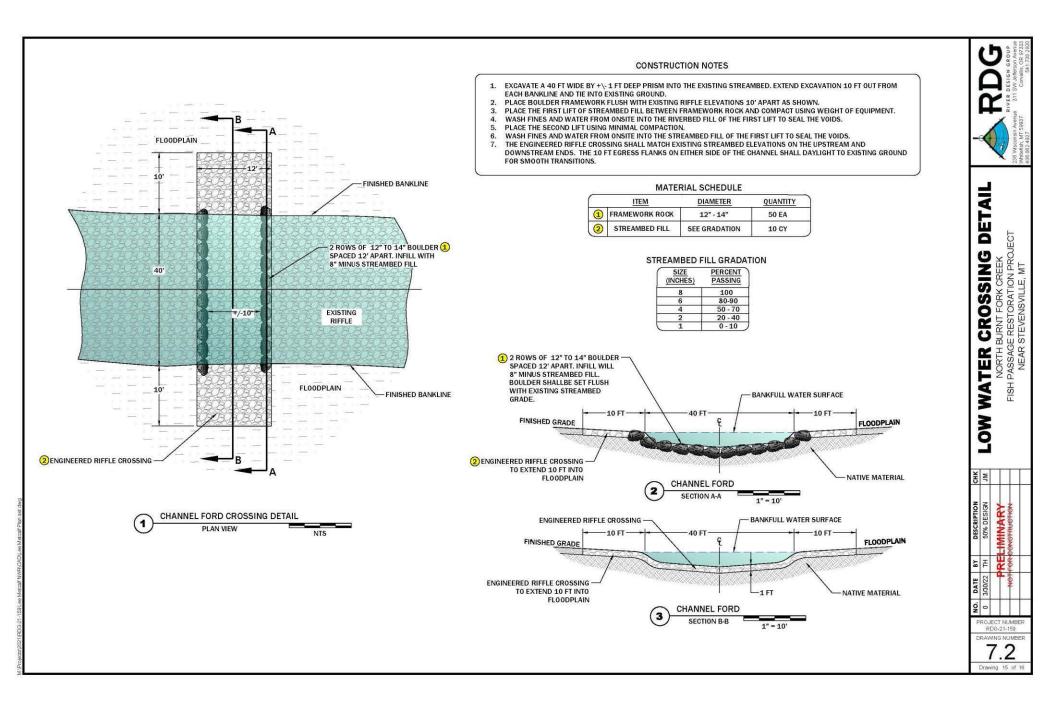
Low Water Crossing detail at Station 17+00. Figure created by River Design Group
